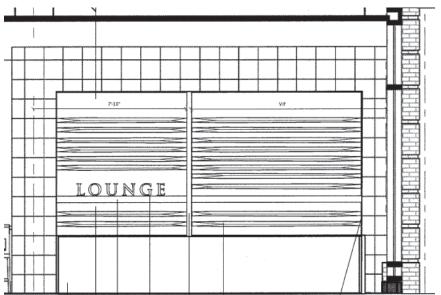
Lounge Branding Wall Elevation | Seen From Lobby
